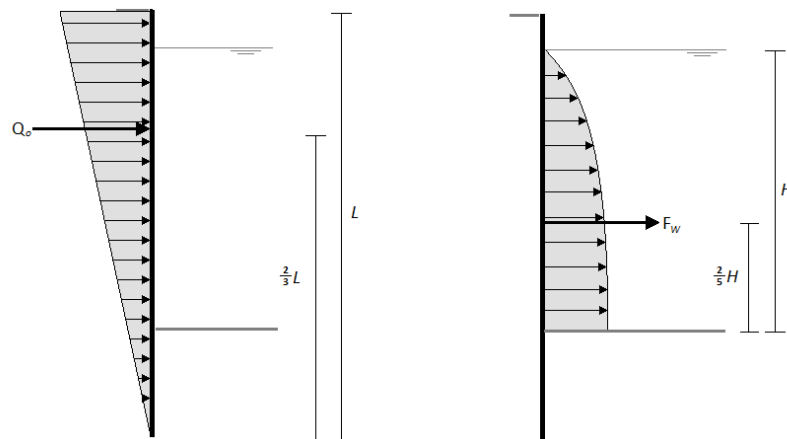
The loads on a sheet pile wall due to an earthquake
